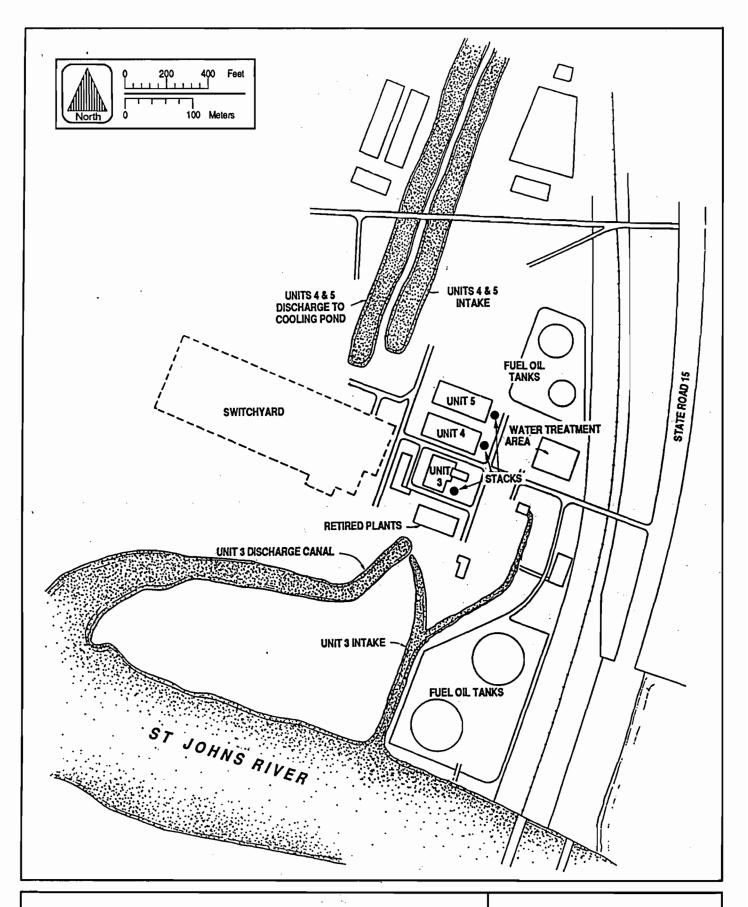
PLOT PLAN OF FPL SANFORD PLANT
